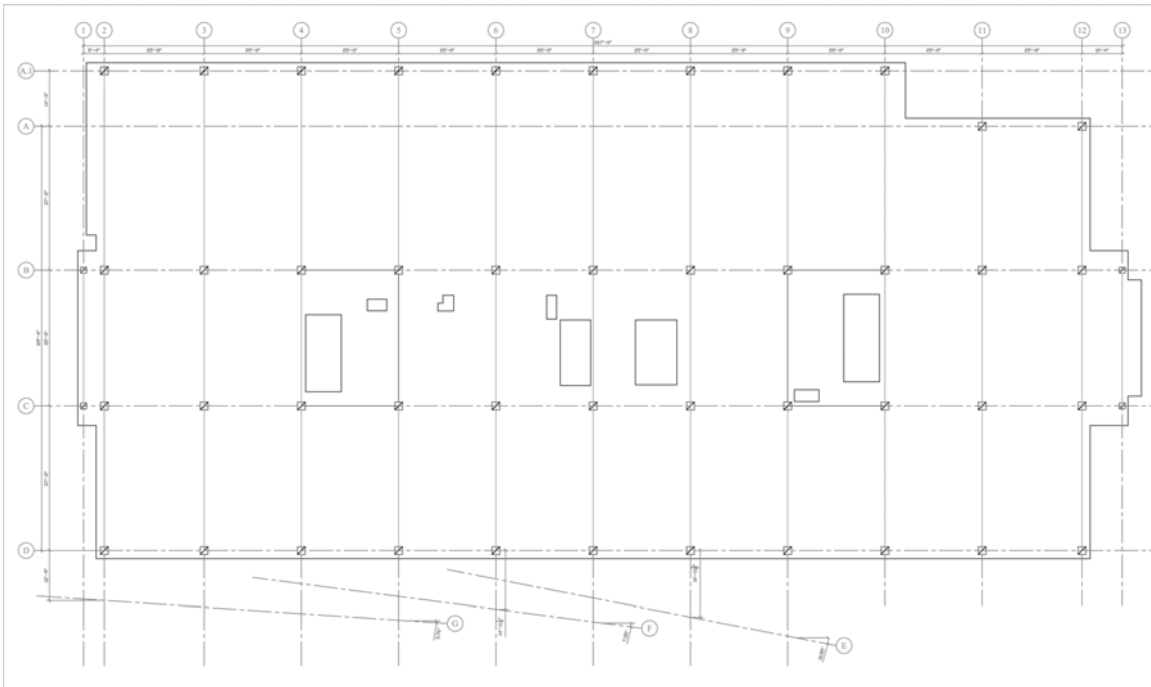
5<sup>th</sup> Floor Plan – Concrete
